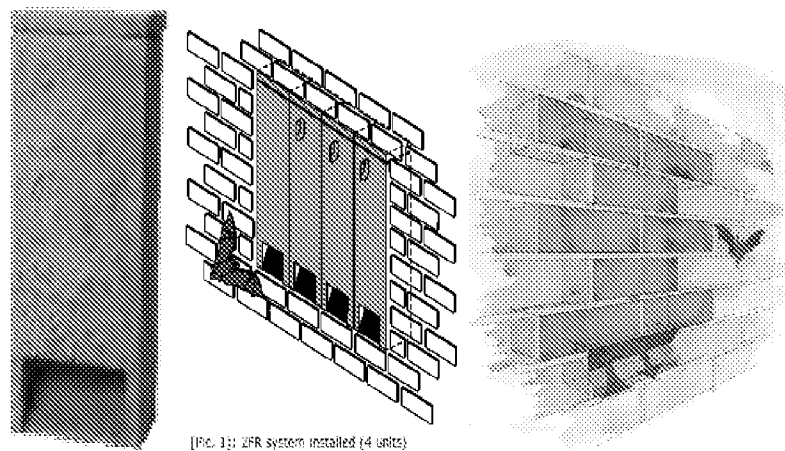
Bat tubes incorporated into the wall of a building to provide roosting space
